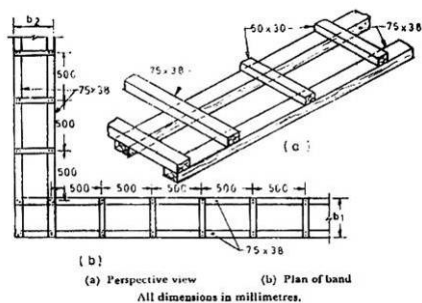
Illustration from Indian Standard 13828, the Govt. of India code for *Low Strength Masonry Buildings* published in 1993. These ladder-like timber frames are exactly what is hidden in the walls of traditional *taq* construction in Kashmir, as seen in Figure 1,2 & 6.
